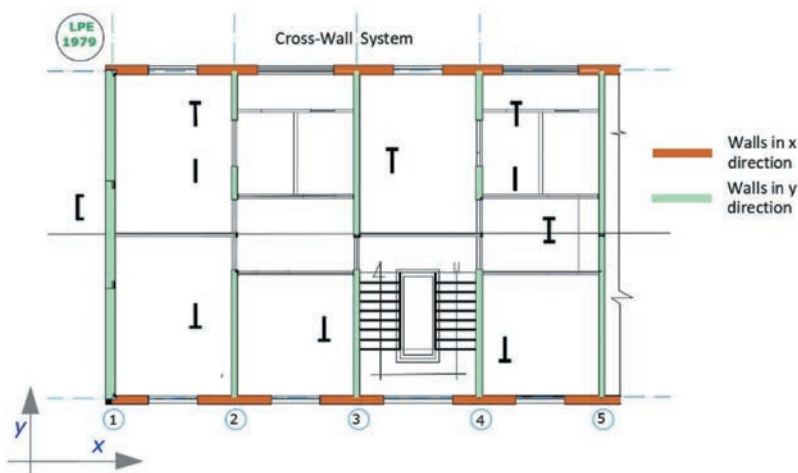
Floor plan of a typical Albanian LPE building: shear walls aligned in longitudinal (X) and transverse (Y) directions.
